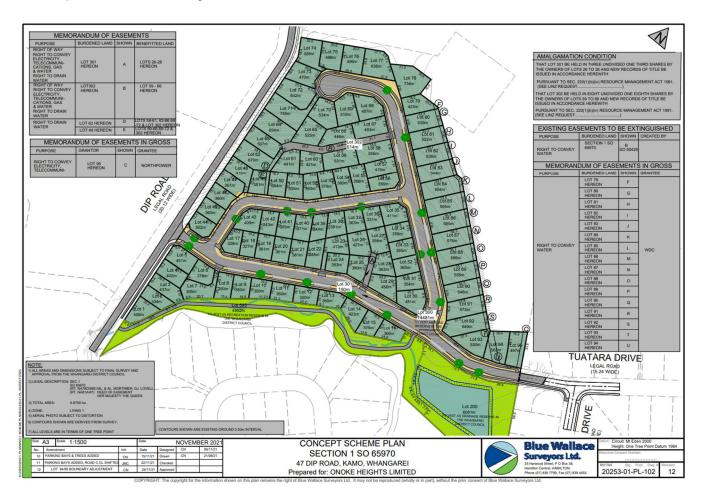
Proposed scheme plan provided by Blue Wallace Surveyors Ltd.
